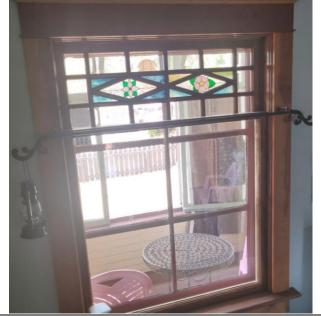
Example of typical 1-over-1 wooden window sash. Note: storm window is not regulated)
